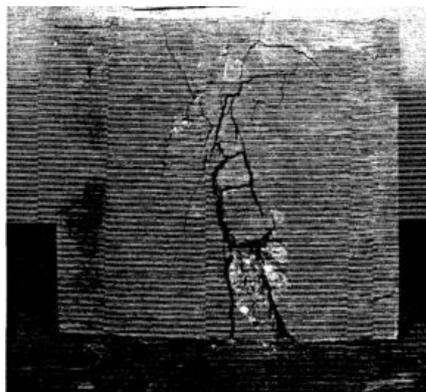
Typical concrete splitting and crushing failure in concrete slab.
